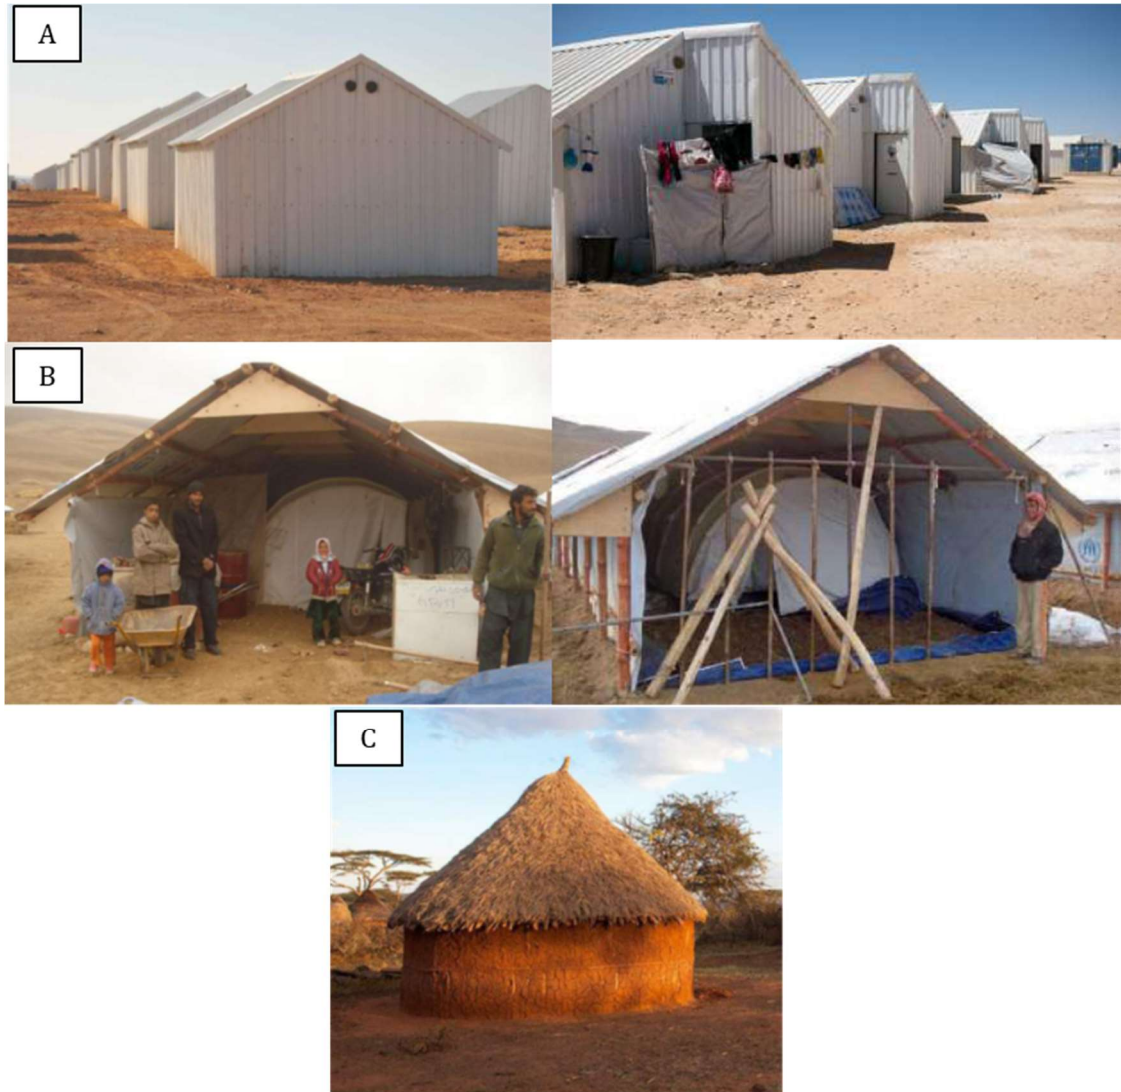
Shelter Types (a) View of a type A shelter (Photo: UNHCR, Shelter and Settlement Section); (b) View of a type B shelter (Photo: UNHCR, Shelter and Settlement Section); (c) View of a type C shelter (Photo: UNHCR, Shelter and Settlement Section)
